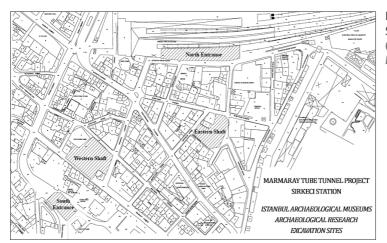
Site plan of Sirkeci Excavations (Istanbul Archaeological Museum Excavation Archive)
